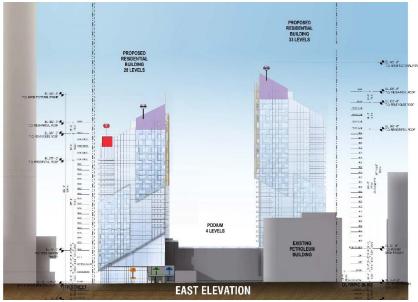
Alternative B Sign Dimensions and Locations – East Elevation
